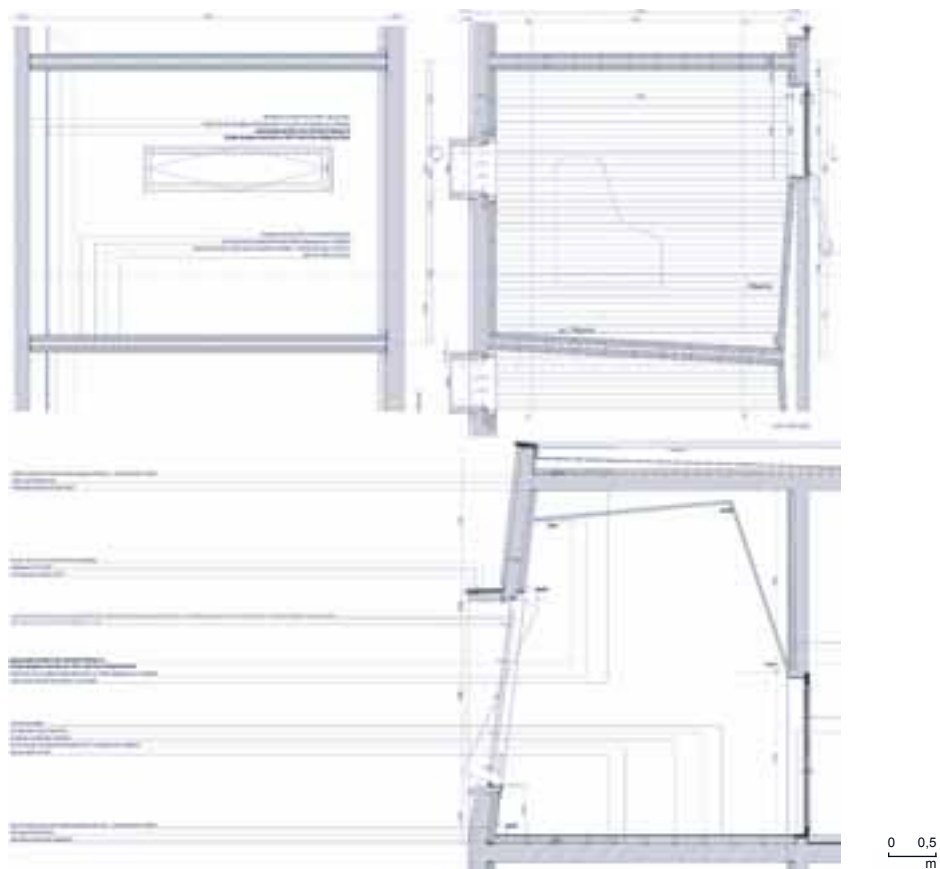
Detailed drawings of a typical music classroom (plan, section and interior façade)
